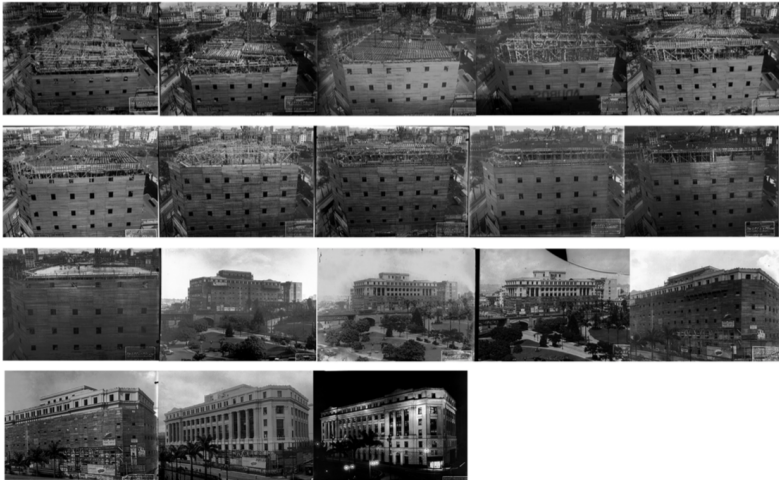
Light & Power*<sup>Cia</sup> building under construction. FAUUSP Library Collection.
